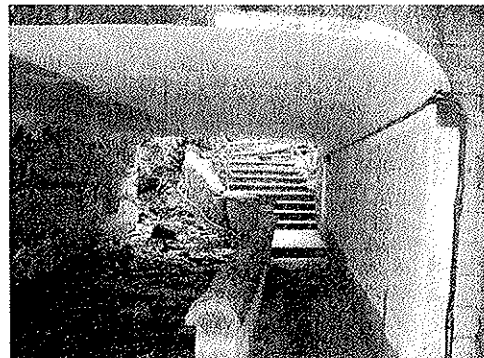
Pedestrian underpass under A82 looking towards the hotel
